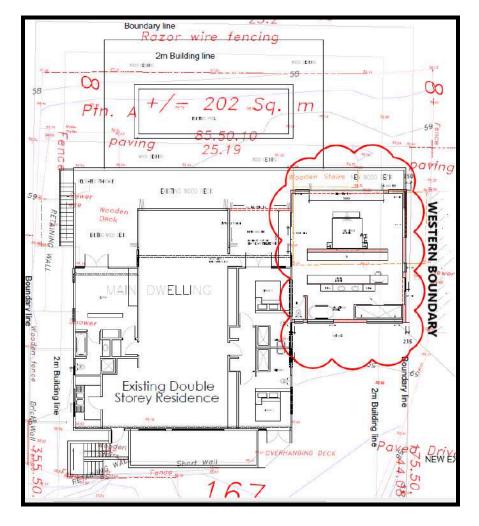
FIRST FLOOR PLAN AND PROPOSED EXTENSION
